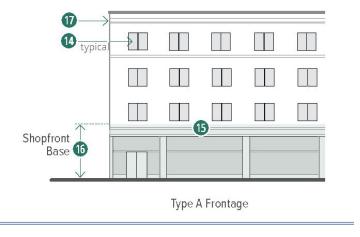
Main Street Storefront Building Elevation: Facade Design Requirements
